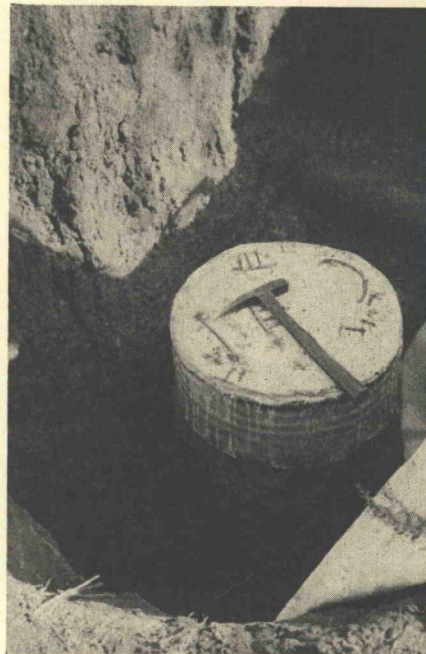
View showing pit after soil had been excavated leaving the undisturbed column of soil. The 7" x 18" diameter concrete top was grouted in place before excavation was begun.
